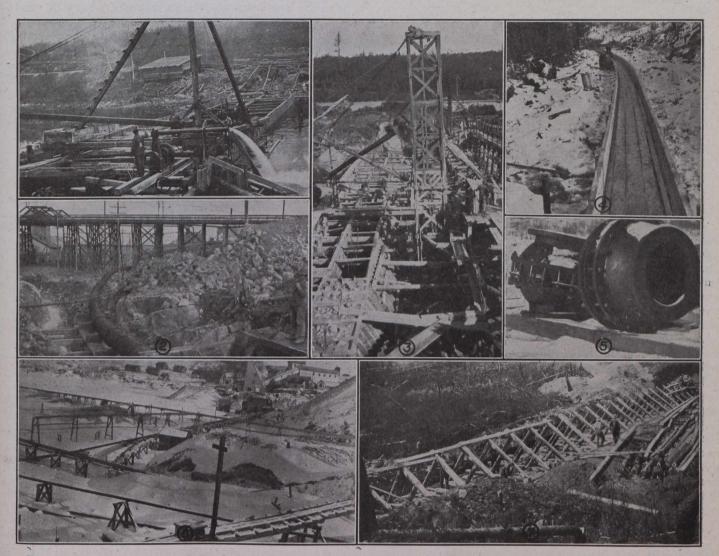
(1) Pumping out Cofferdam at Short Lake. (2) Wood Stave Pipe, carrying discharge from Cobalt Lake Drainage Pumps. (3) Short Lake Dam under construction. (4) Flume from height of land to Brief Lake.
